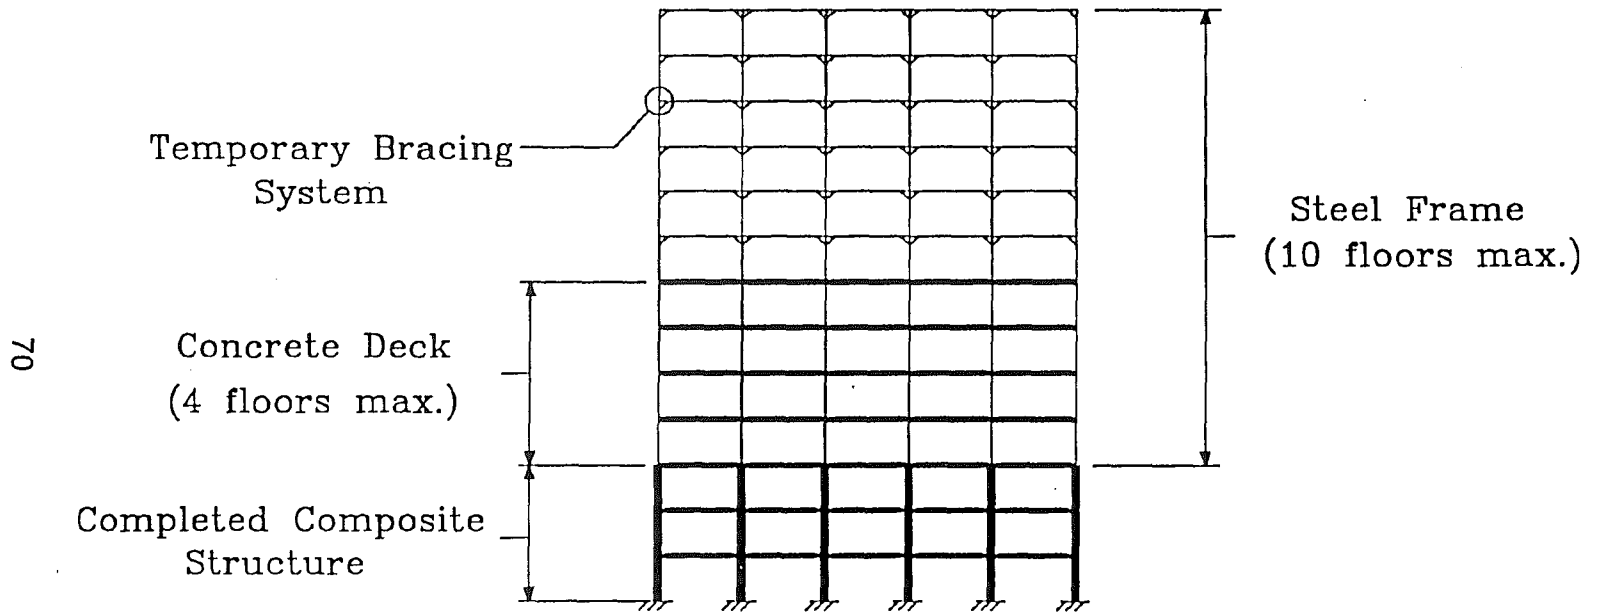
Construction Sequence of Building with SRC Composite Columns
